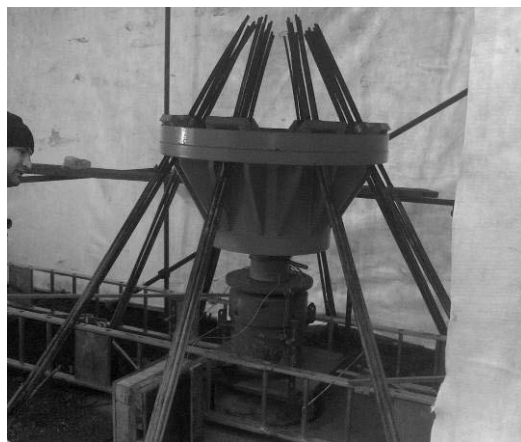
Static pile load test installation for testing 600 mm bored pile to the maximum Load 4500 kPa.
